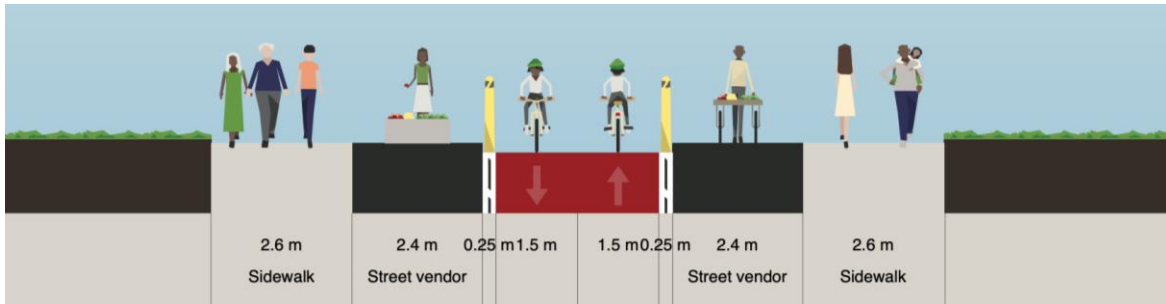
Walthamstow High Street Proposed Streetscape (Streetmix, 2024)
